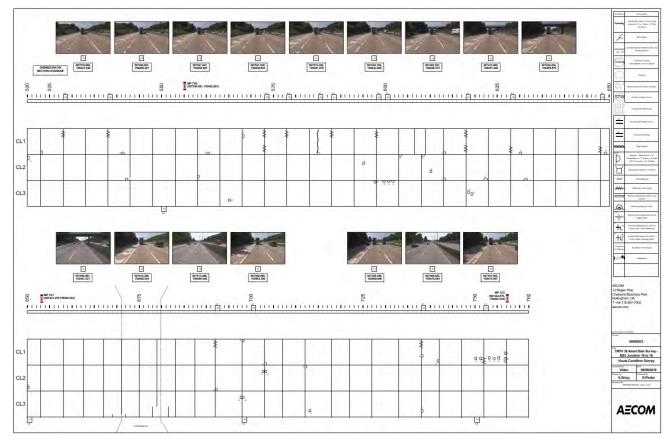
Example VCS strip plan for a jointed concrete pavement
